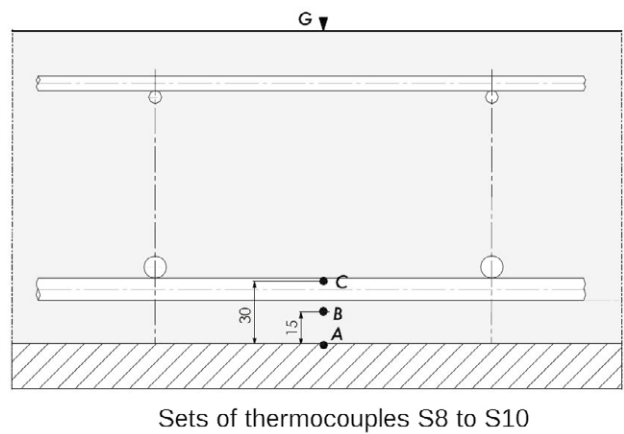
positions of the additional thermocouples in the concrete test slab in the case of board type fire protection materials (cross-section)
